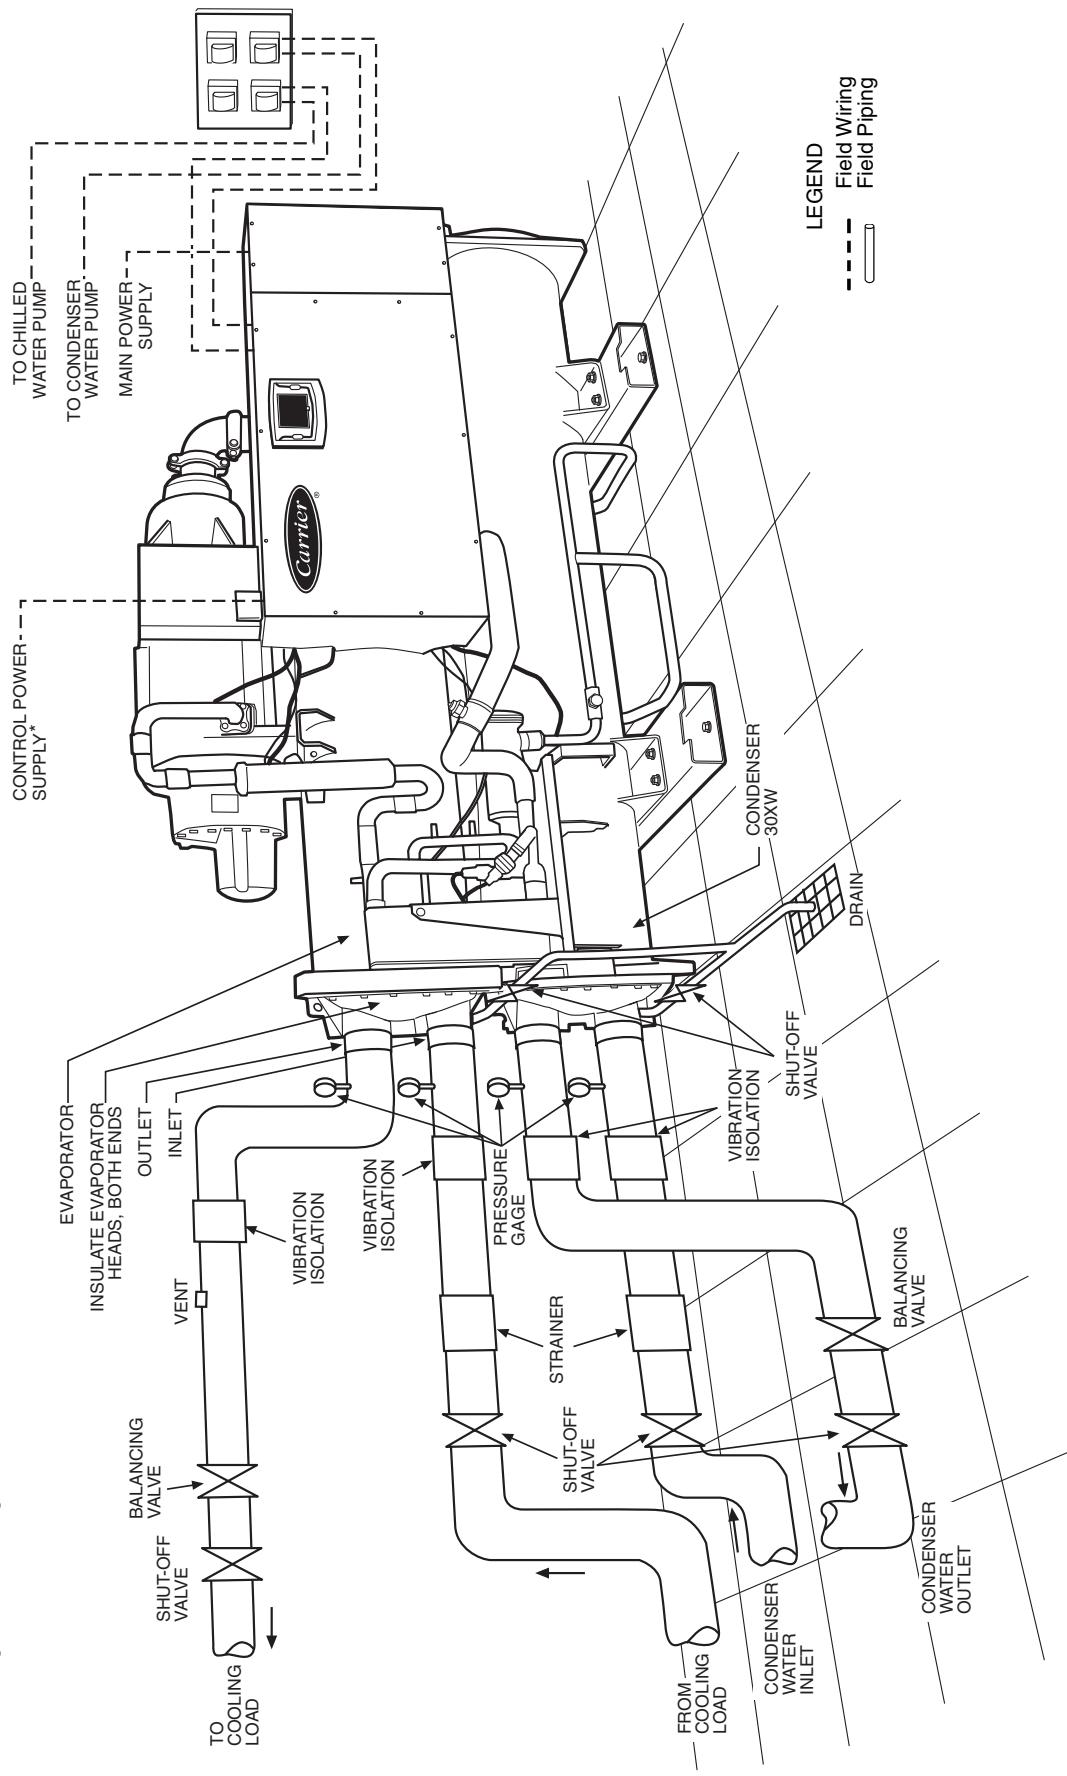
Typical Evaporator and Condenser Piping and Wiring — 30XW150-300
